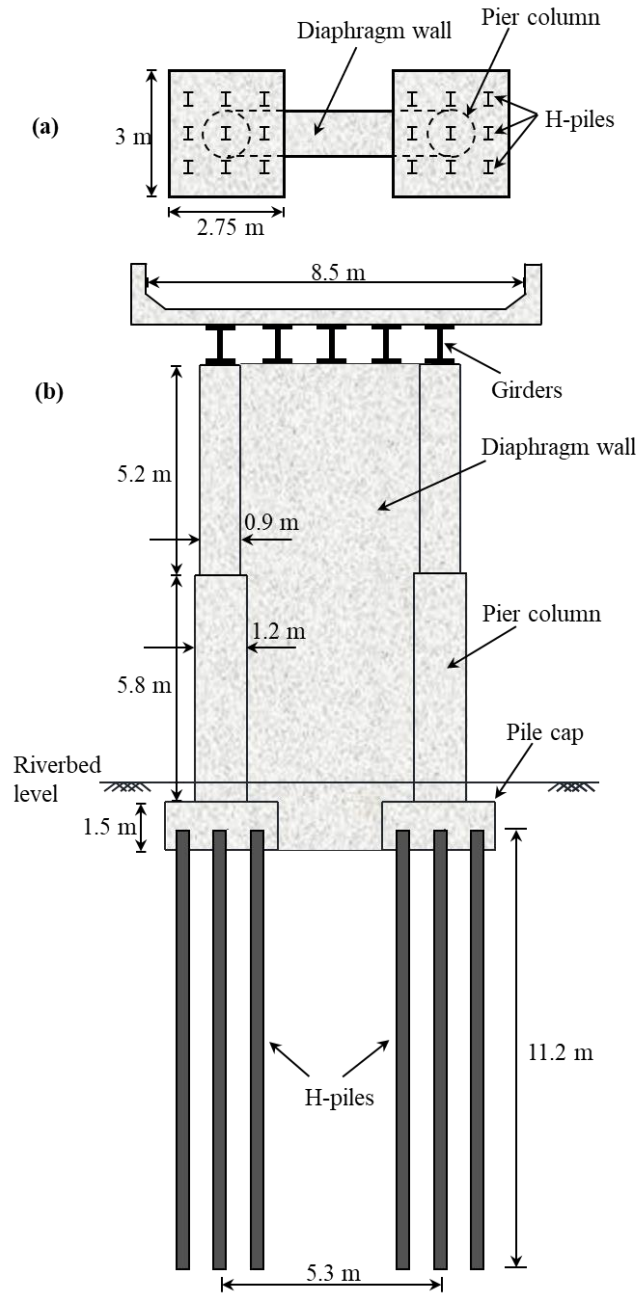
Layout of bridge pier with pile configuration (a) plan view of pile caps (b) side view of pier and H-piles
